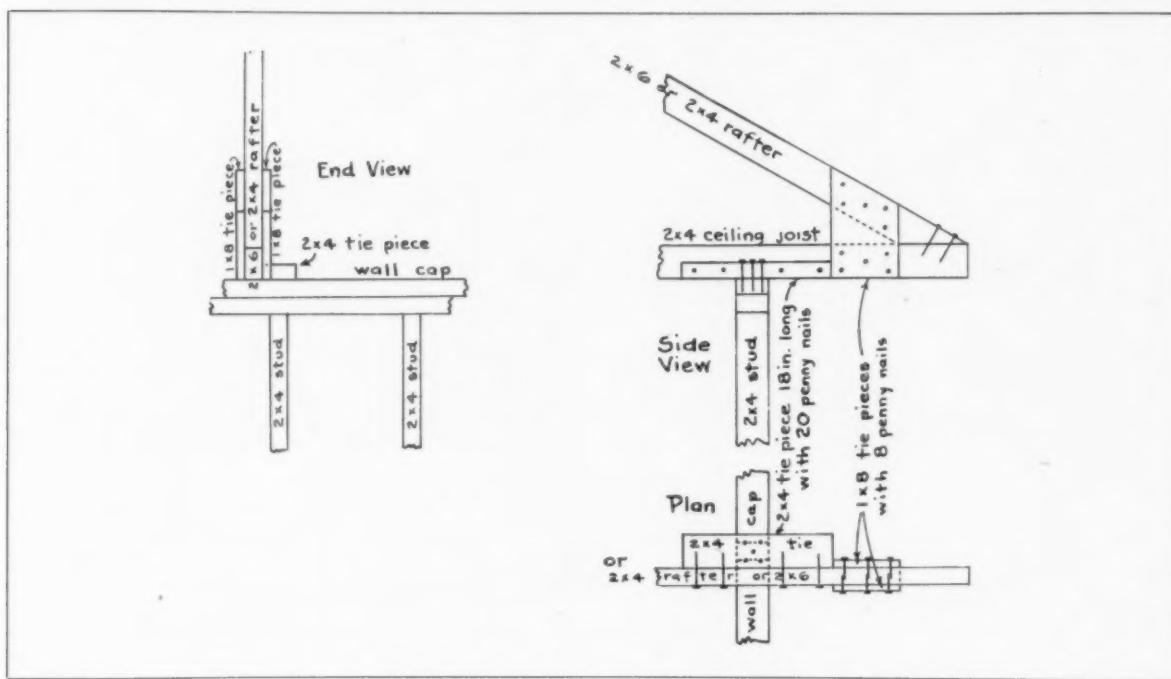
A Third Method of Anchoring the Roof to the Exterior Walls
